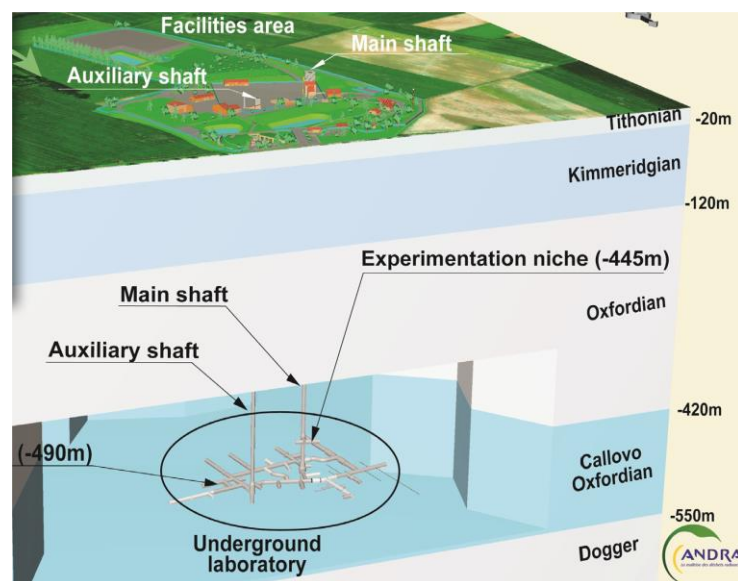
Underground laboratory (URL) and its structure (De La Vaissière et al., 2014)
